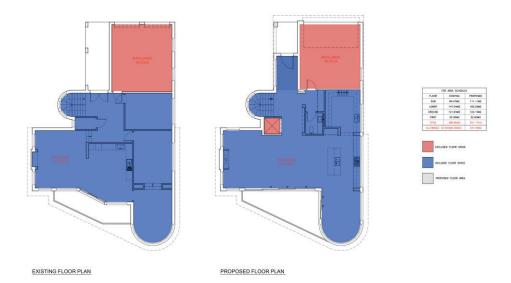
Figure E: Ground Floor Plans – existing and proposed – showing changes to floor layout and area of additional GFA
